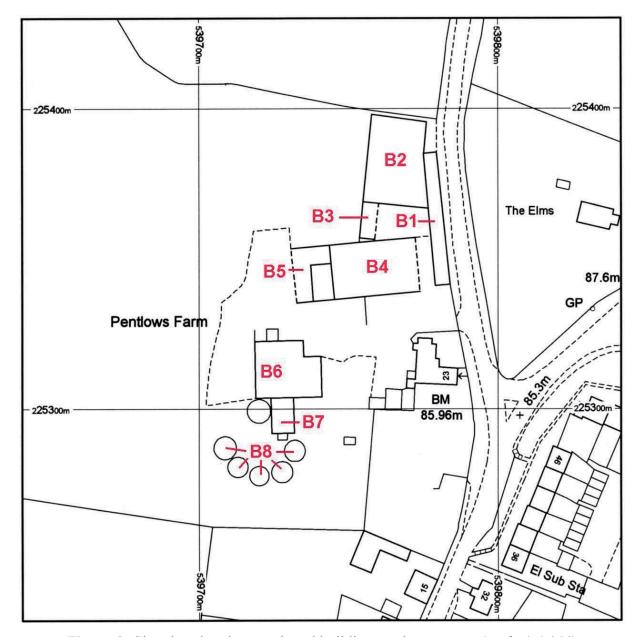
Site plan showing numbered buildings and structures (scale 1:1,250)
